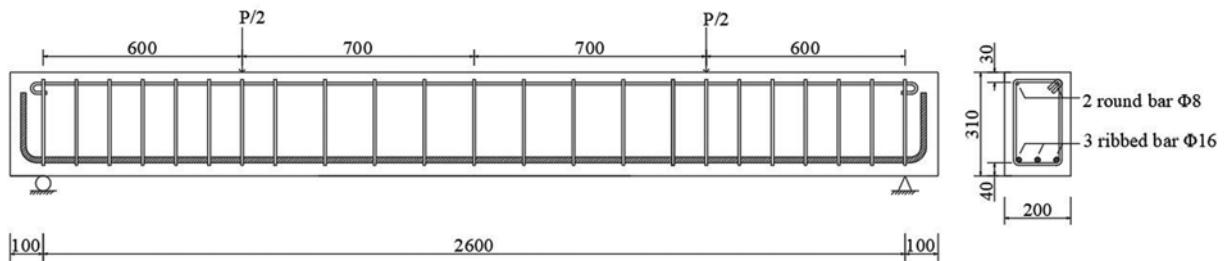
Layout of the Test Beams with a Span of 2,600 mm (unit: mm)
